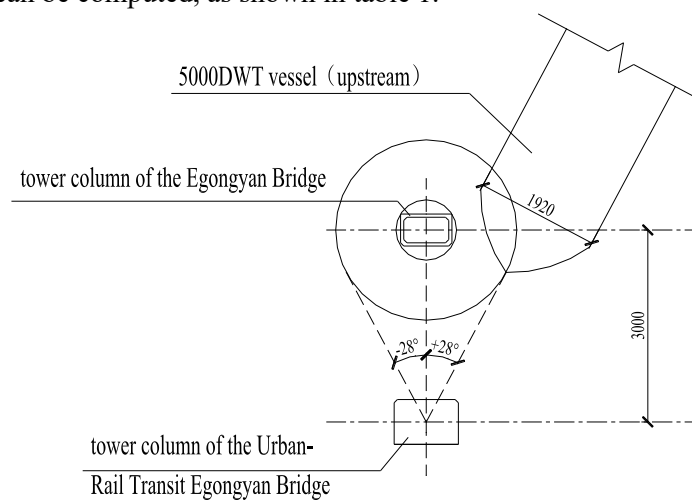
Protection angle provided by the existing Egongyan Bridge.
